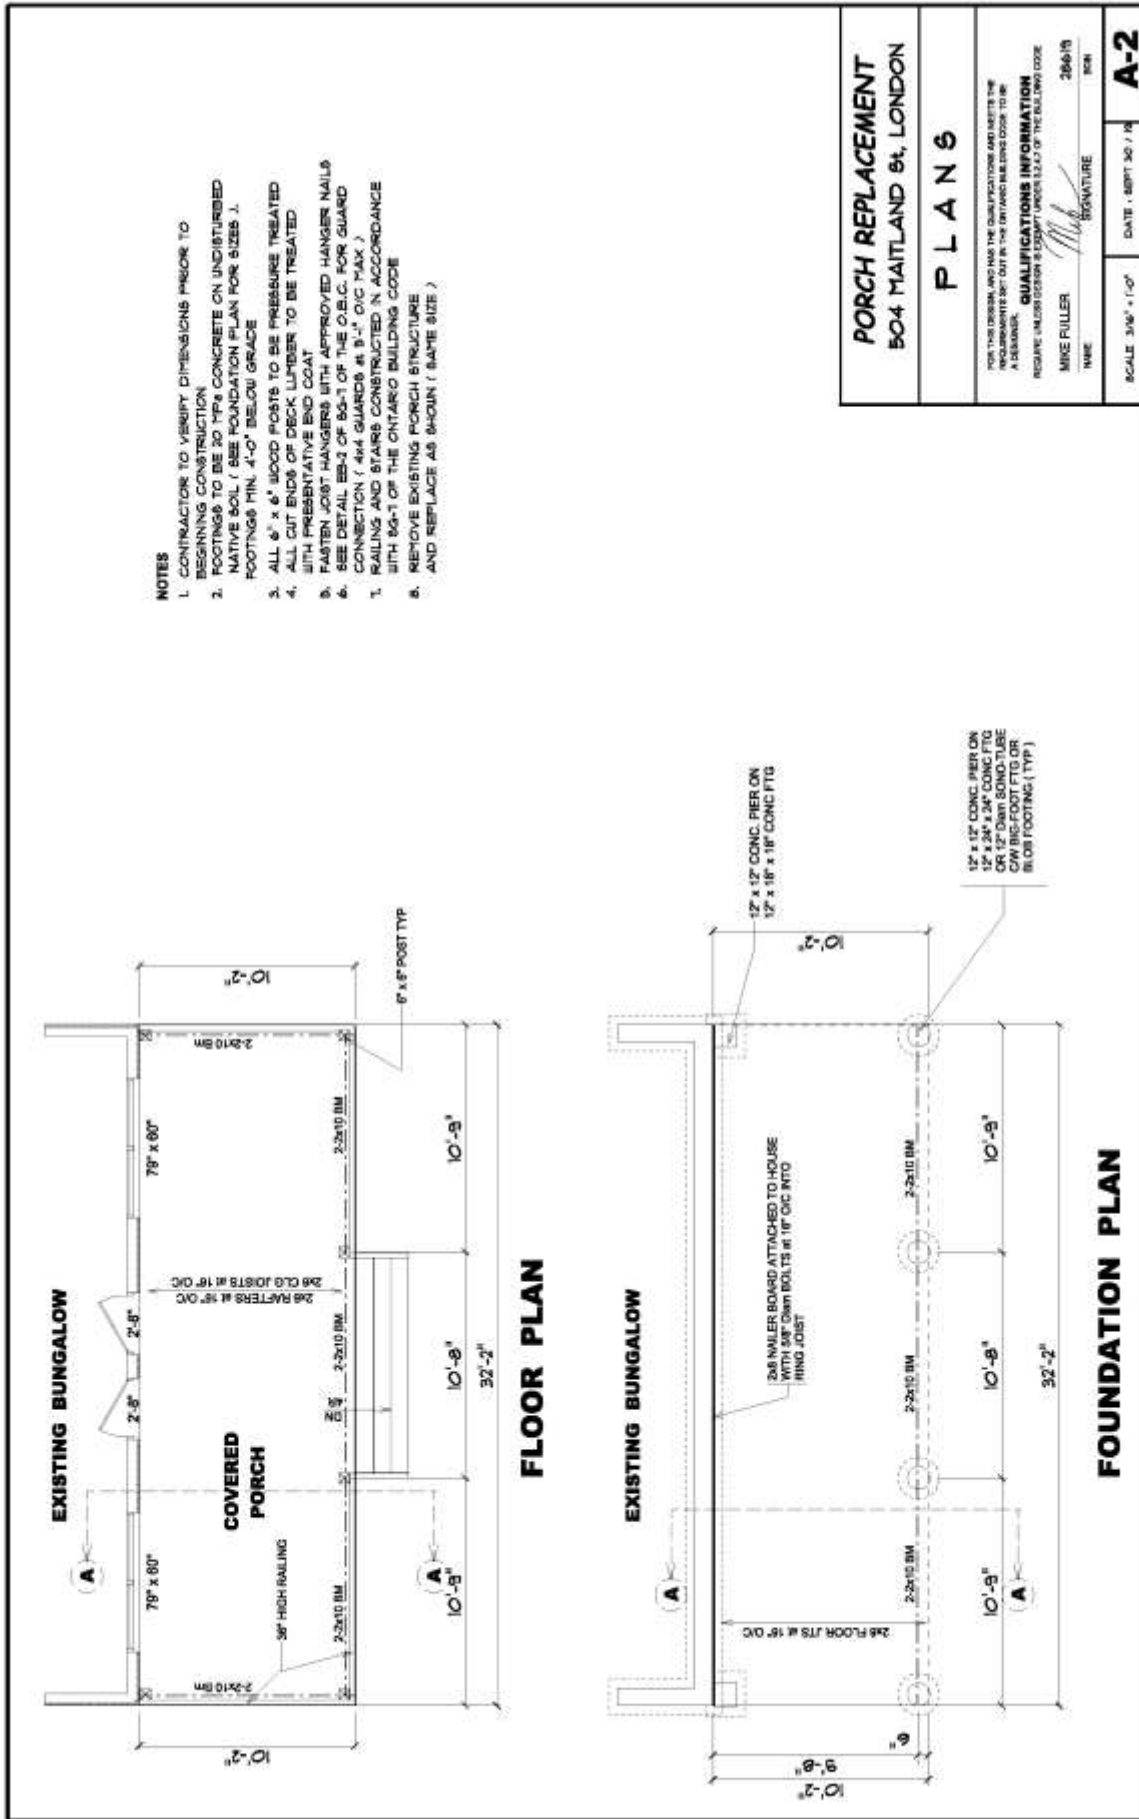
Plans showing the proposed porch alteration and proposed dormer for the existing semi-detached dwellings at 504-506 Maitland Street.
